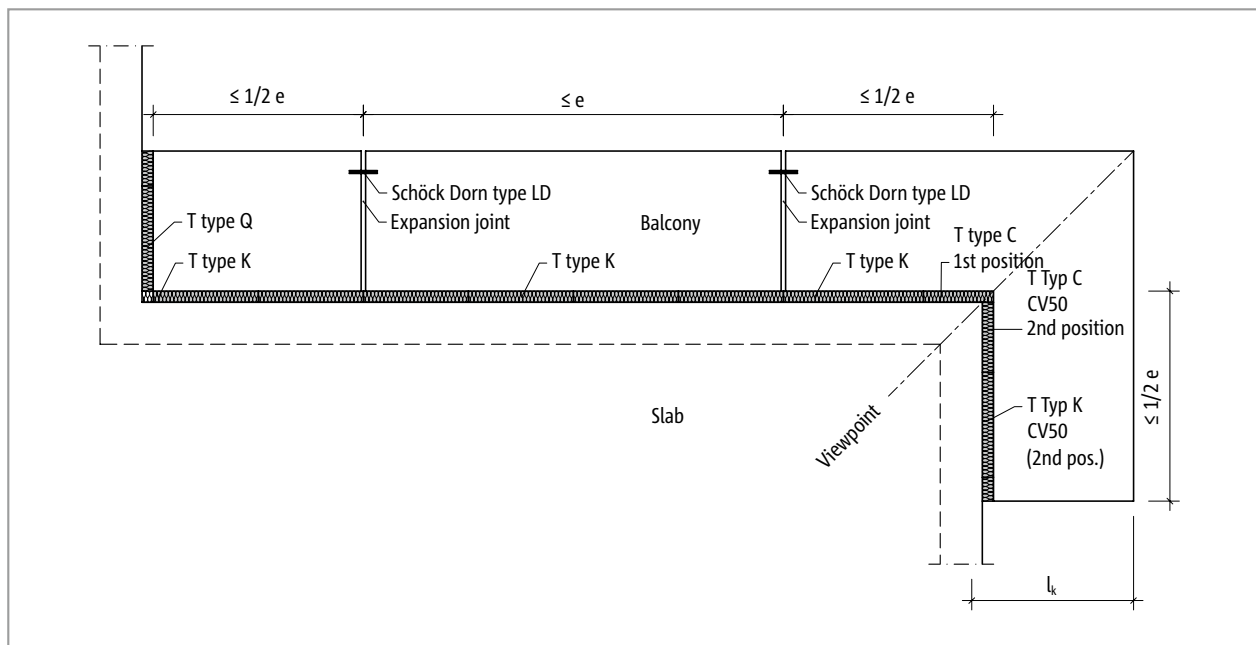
Schöck Isokorb® T type C: Expansion joint spacing
